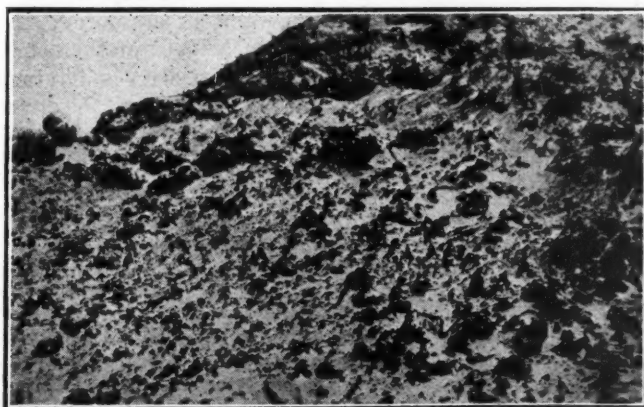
RUINS OF THE MAGAZINE AFTER EXPLOSION
